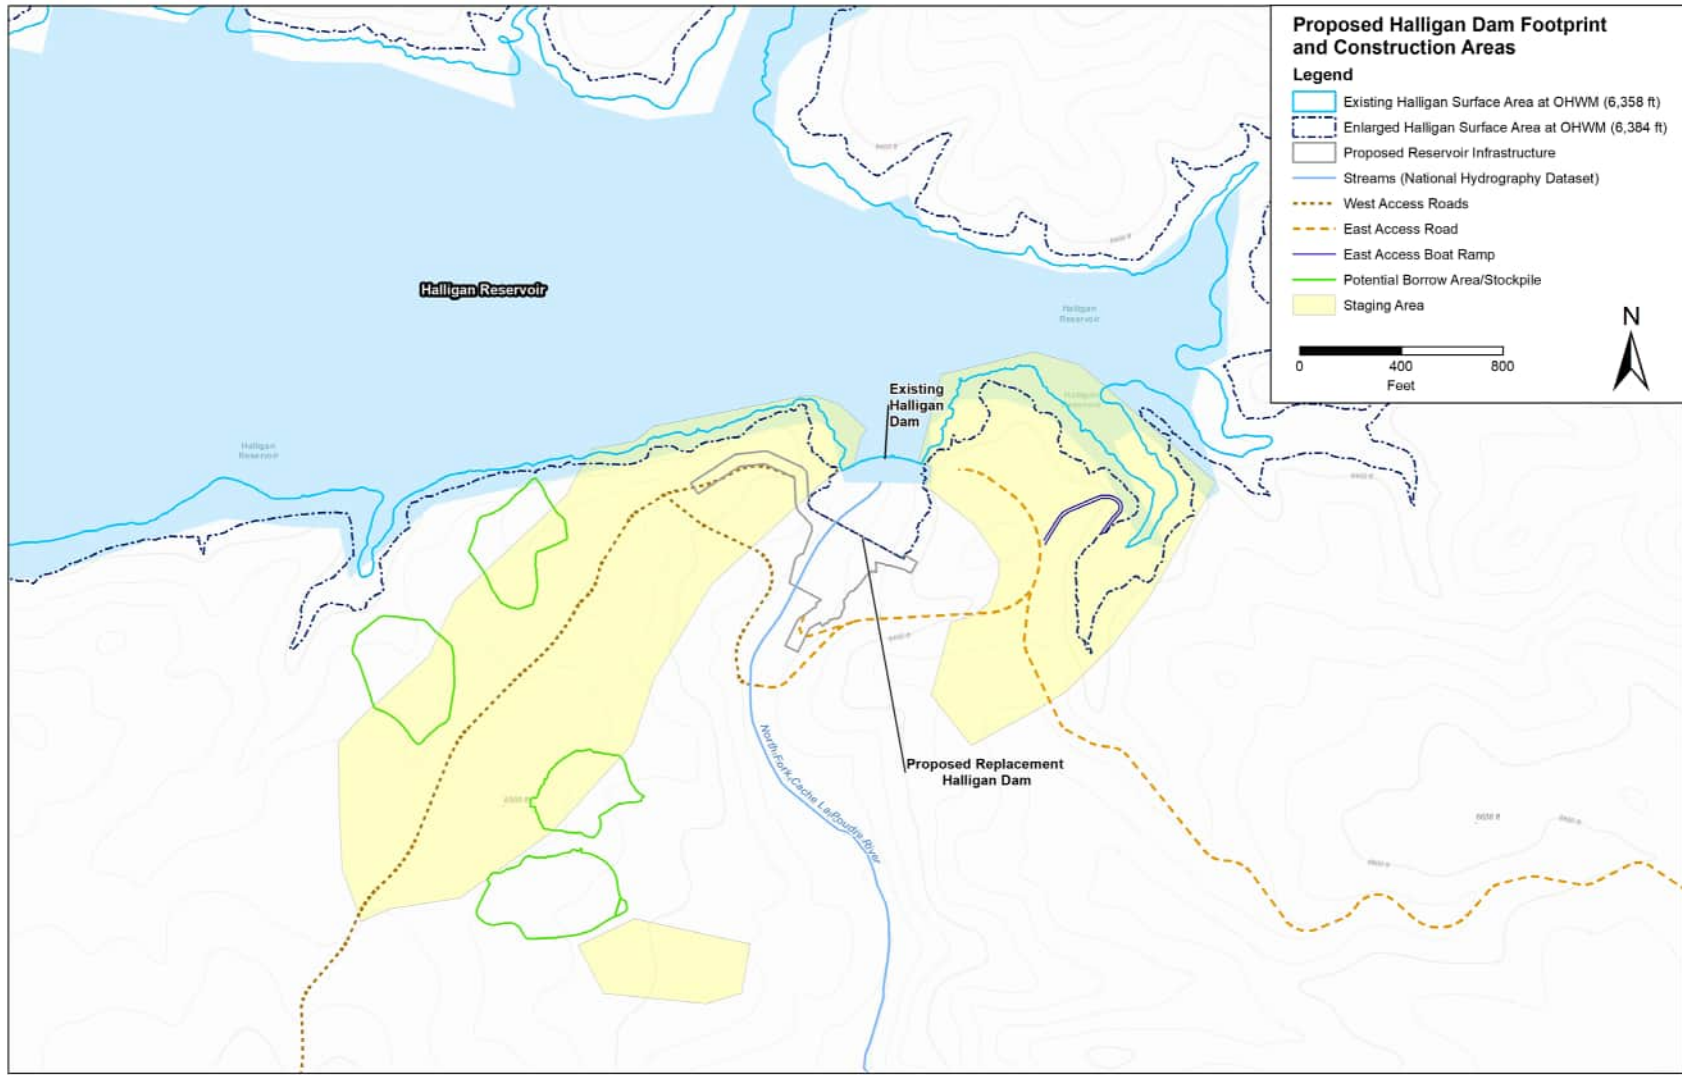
Proposed Halligan Dam Footprint and Construction Areas
